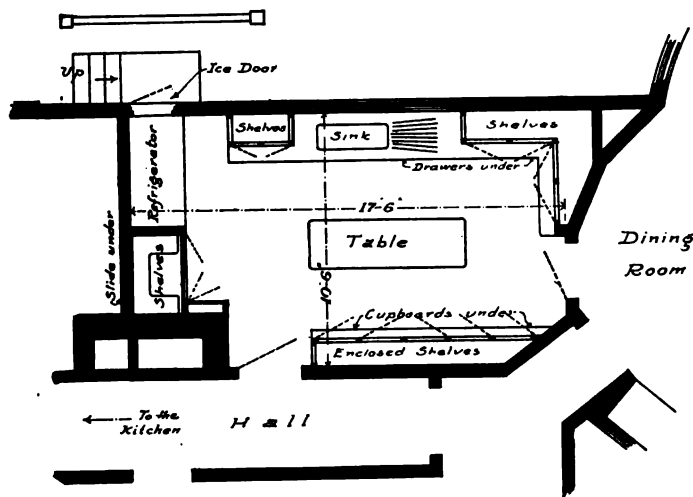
PLAN OF THE PANTRY SHOWN BELOW
